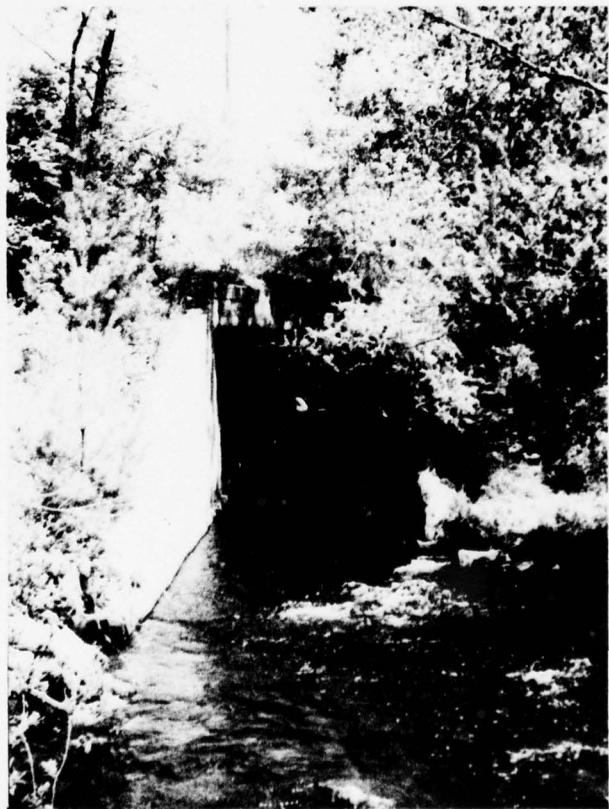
BOX CULVERT DOWNSTREAM UNDER STATE ROUTE 28
